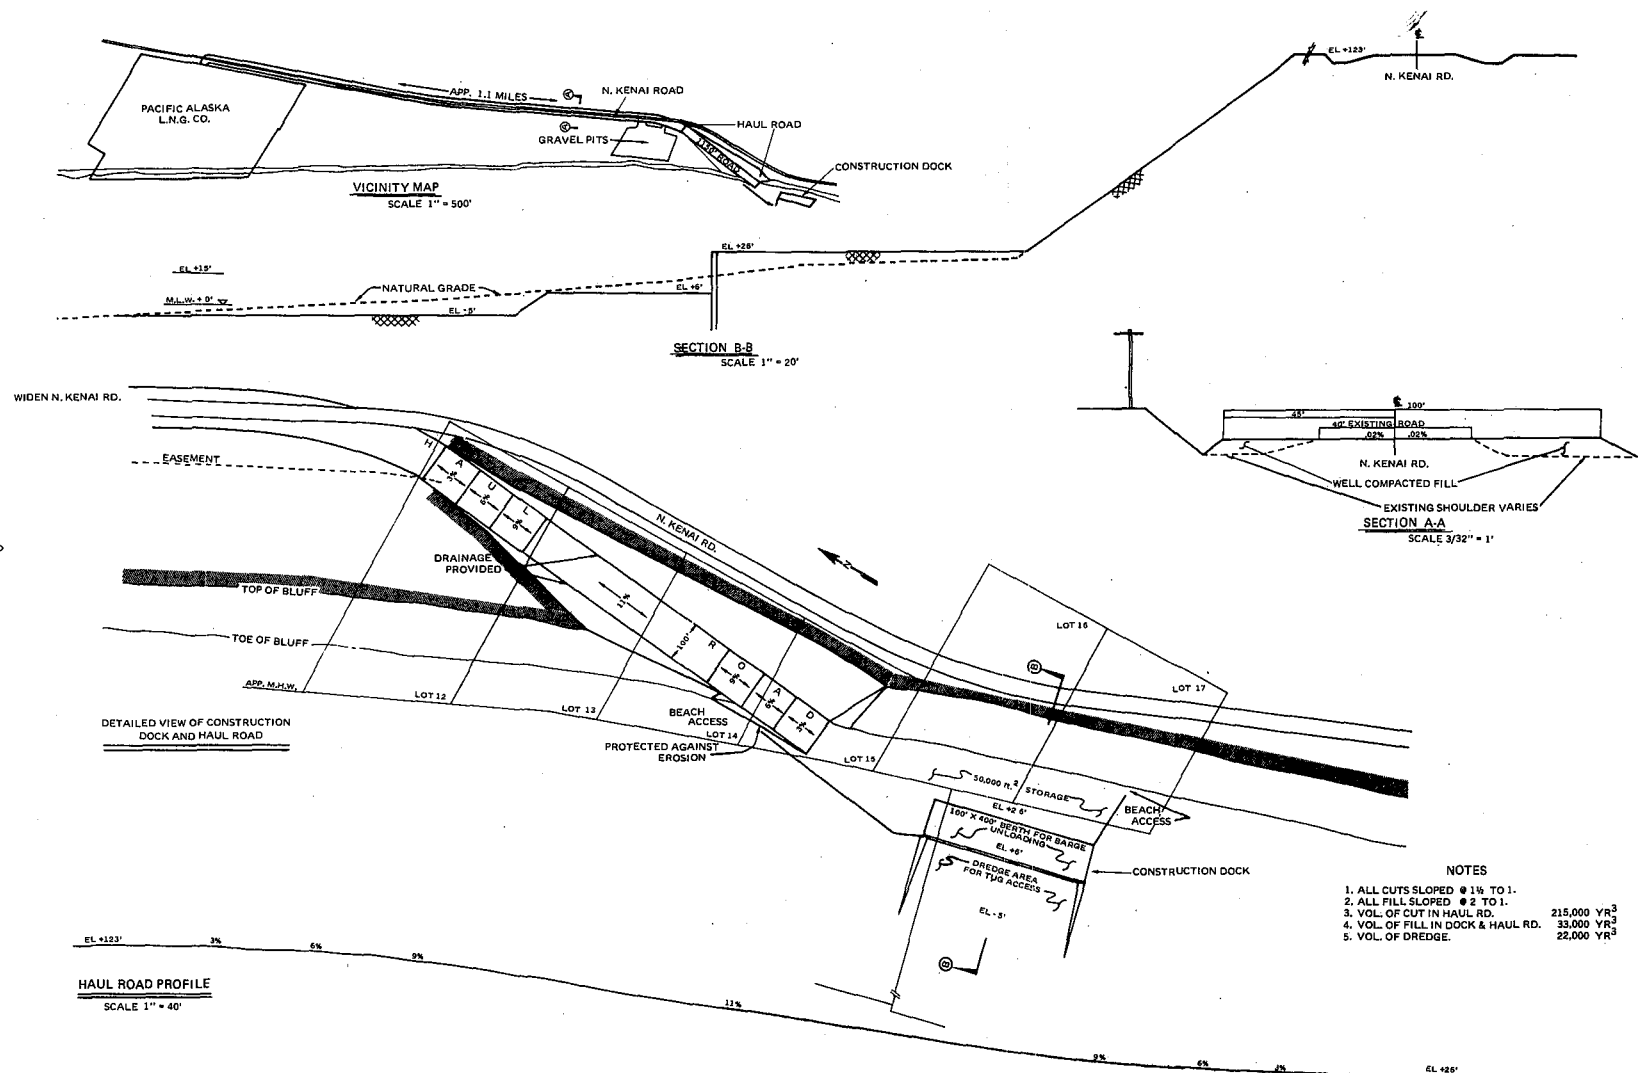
Proposed Construction Dock and Haul Road at Nikiski, Alaska
